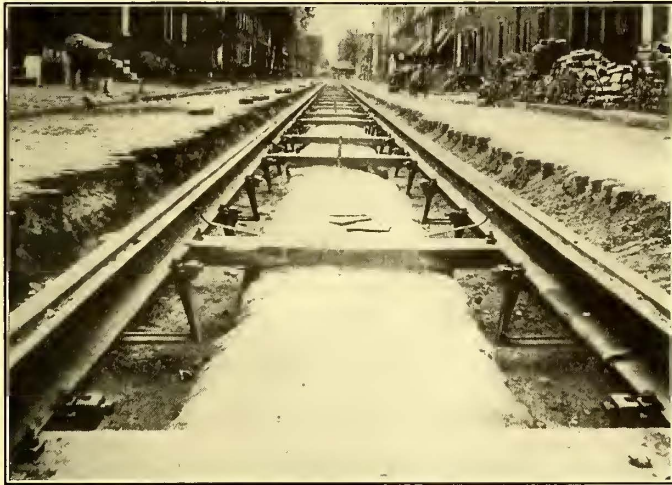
RAIL CLAMPED TO TEMPORARY TIES AND CAST IRON CHAIRS ATTACHED TO RAIL
